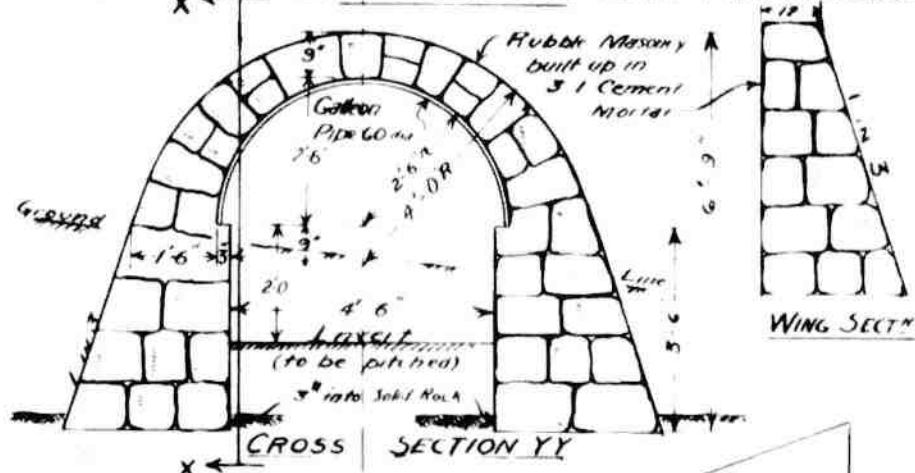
Original drawing no. 11375 of Culvert 187A (Fairy Falls) at 22,131' through chainage. The original timber decking was replaced with concrete decking in the 1960s. This is the only culvert on the road with a documented diversion bank above the inlet. Source: Qld State Archives
